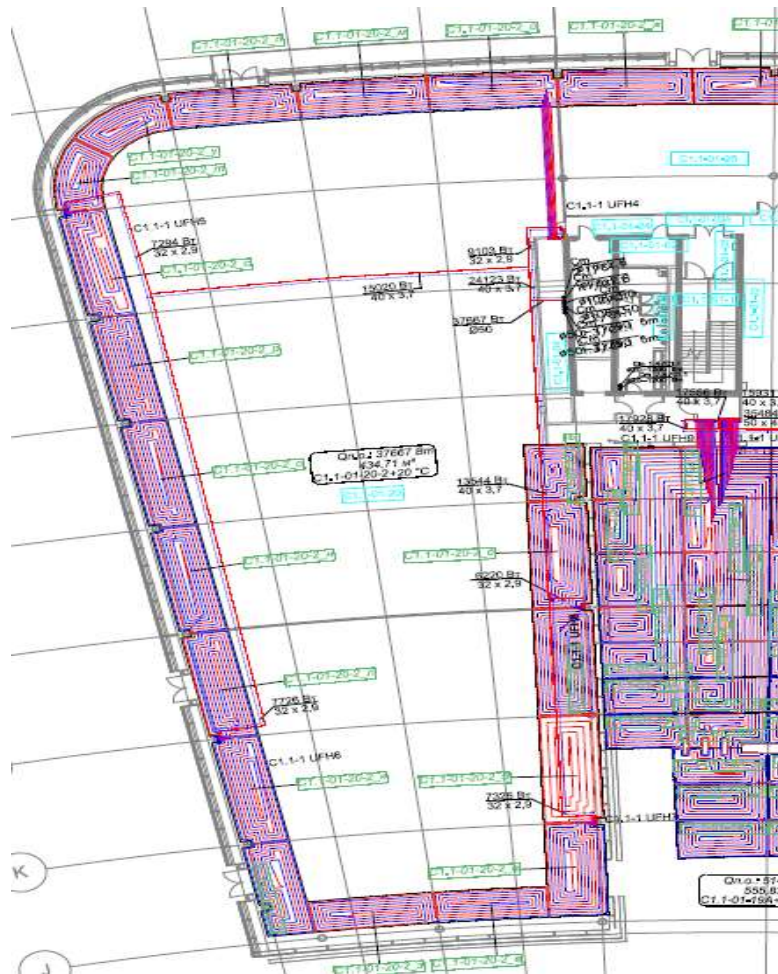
Rough layout of the floor heating in the Facility in the Official Participants' Pavilions.
